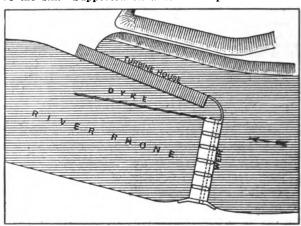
FIG. I.—CHEVRES STATION, GENEVA ELECTRICAL WORKS.
